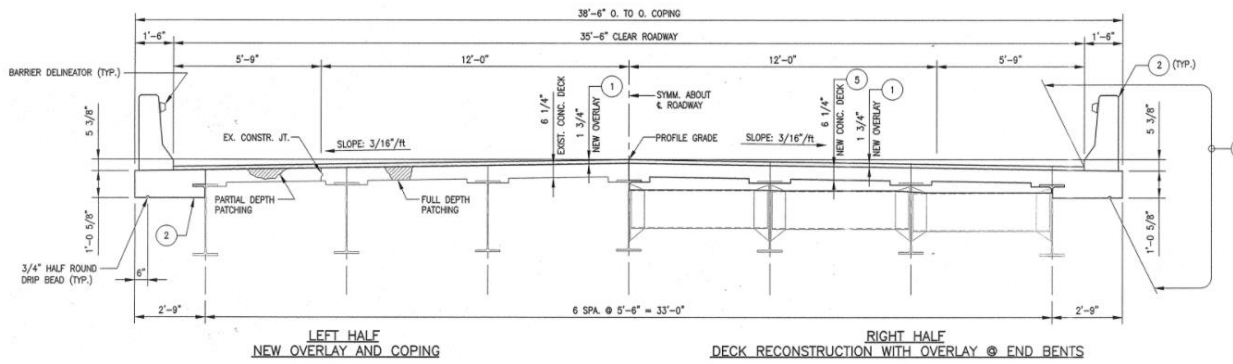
Typical Section of the Bridge (NBI 13000) (2002)
